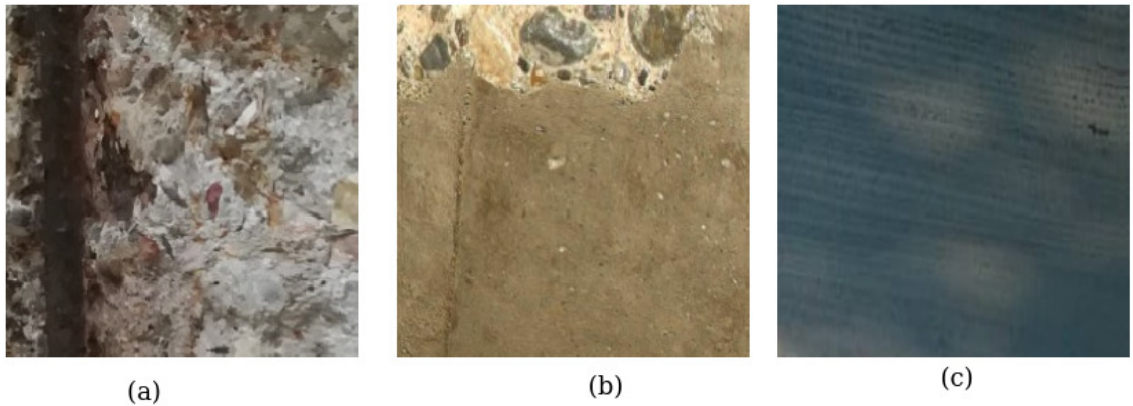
Different level of spalling: (a) Deep Spalling (b) Shallow Spalling (c) No-Spalling.
